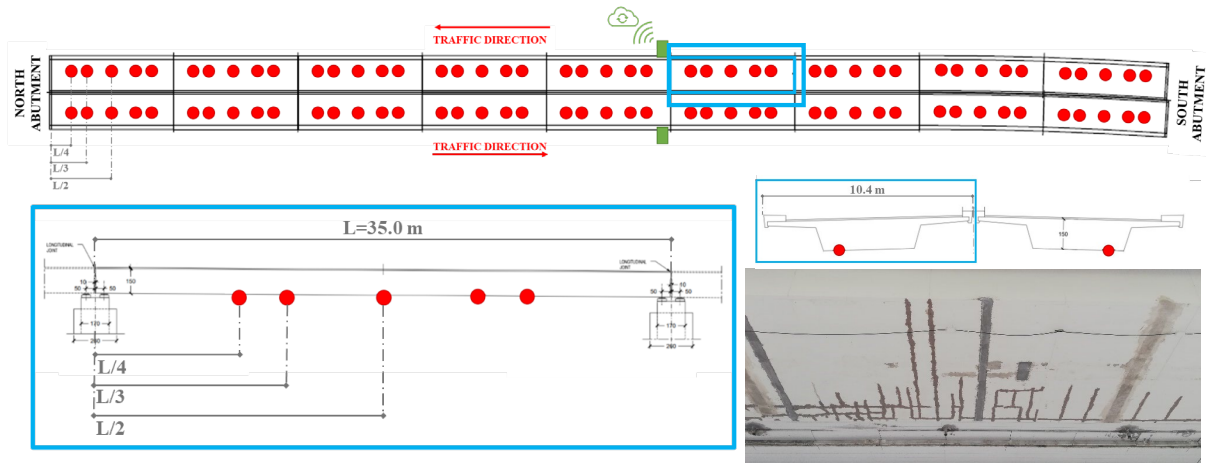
Case study 3 – Geometry, SHM system and view of the cracking pattern after the inspection.
